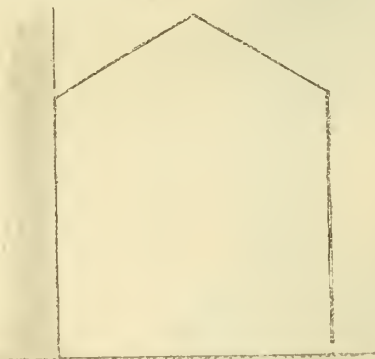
PLAIN SPAN CONSERVATORY AGAINST DWELLING HOUSE.
